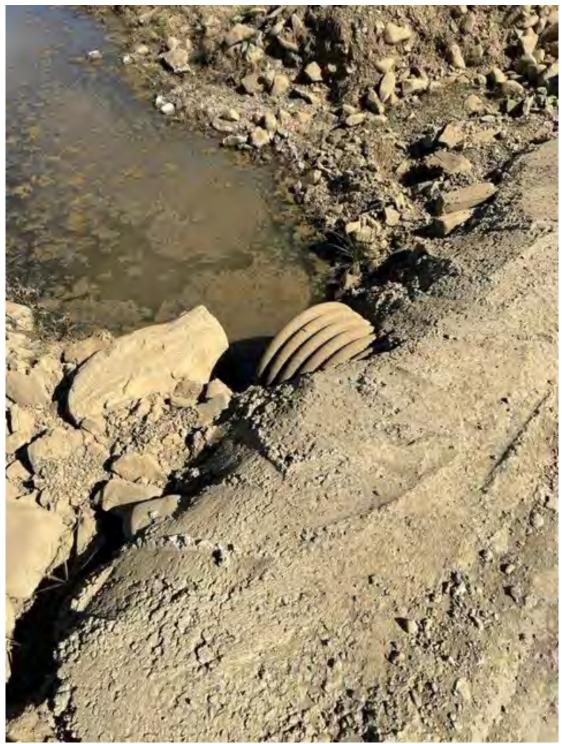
Pipe Culvert n the Creek Crossing on Rannock Burn Road.
